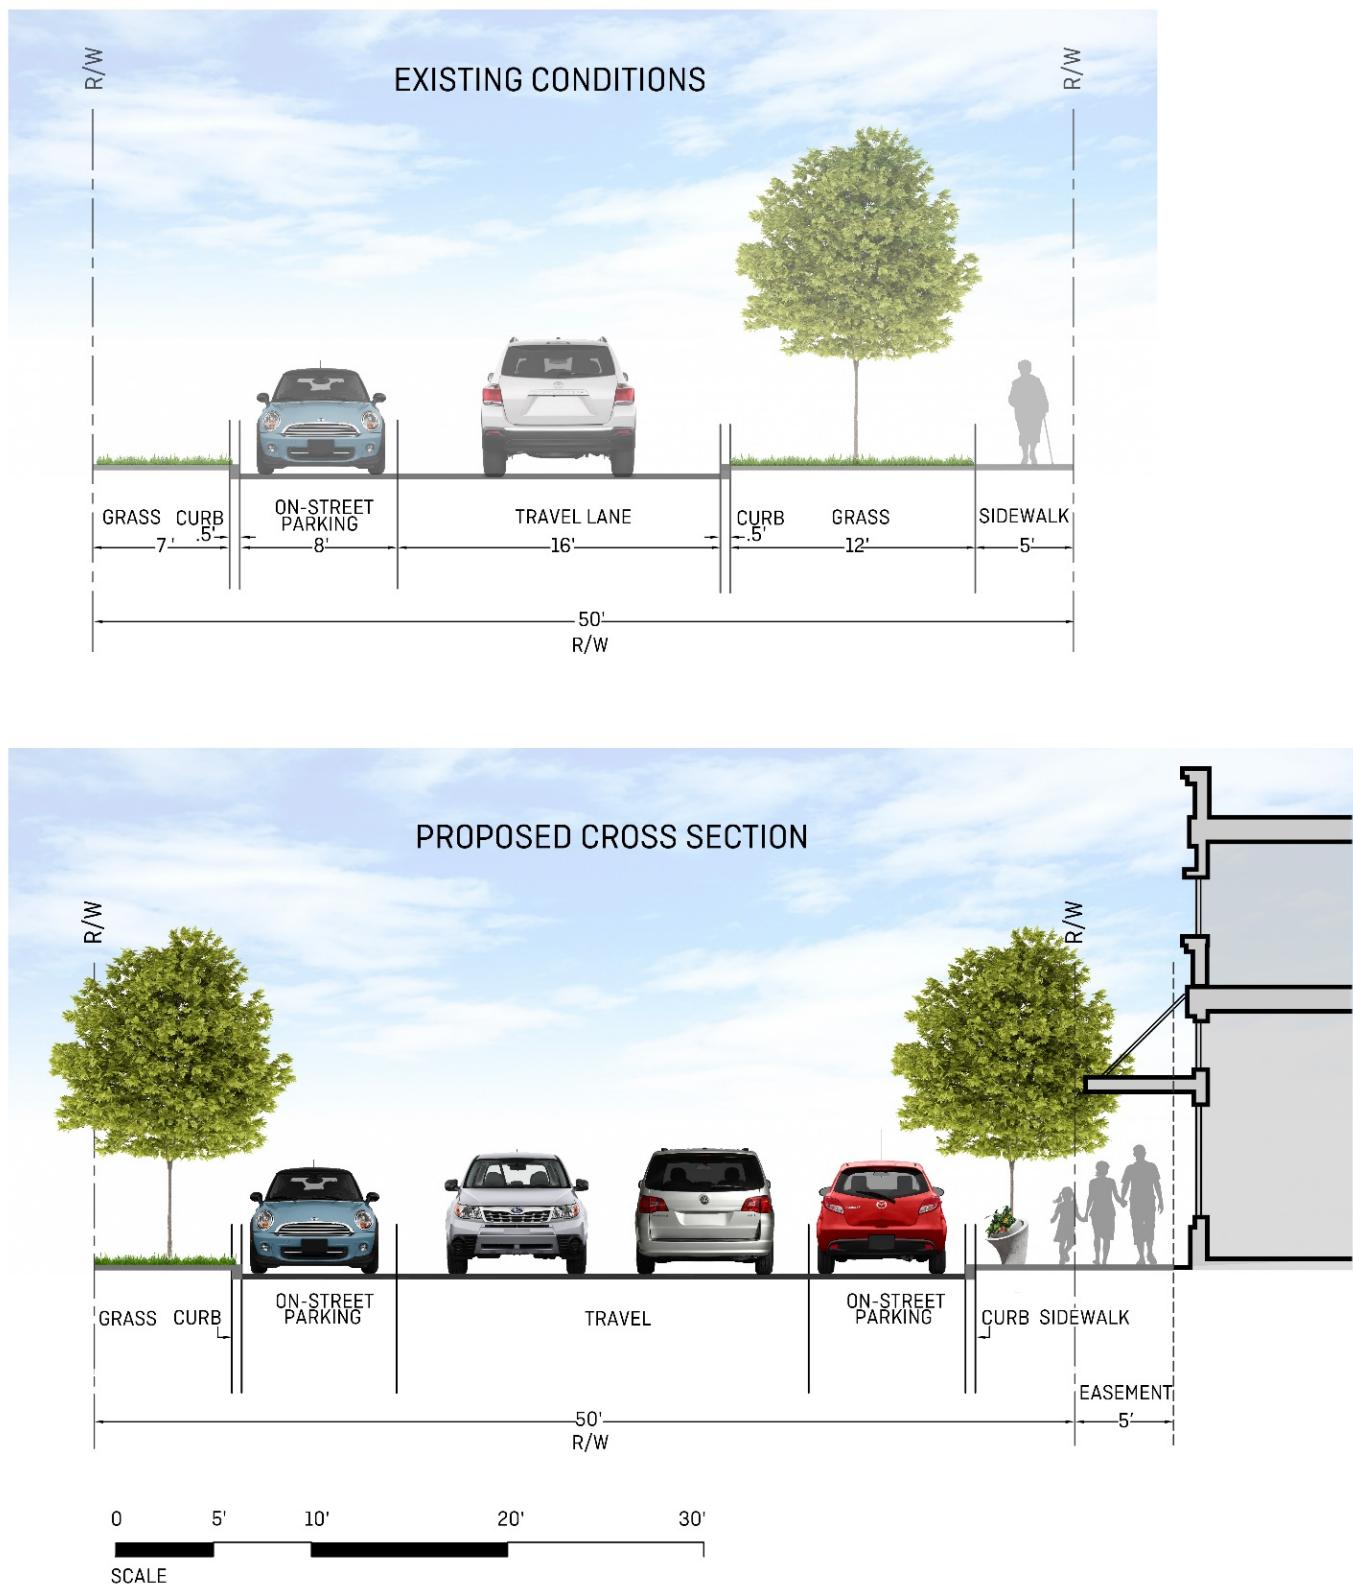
Brookhaven Drive Cross Section west of Ferris Avenue
